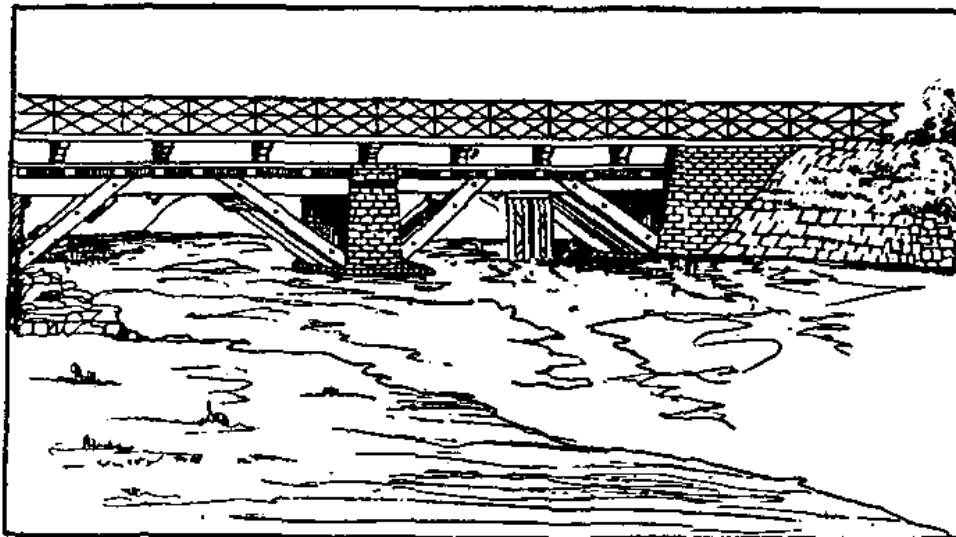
Method of reinforcing floor with struts and intermediate trestles.
